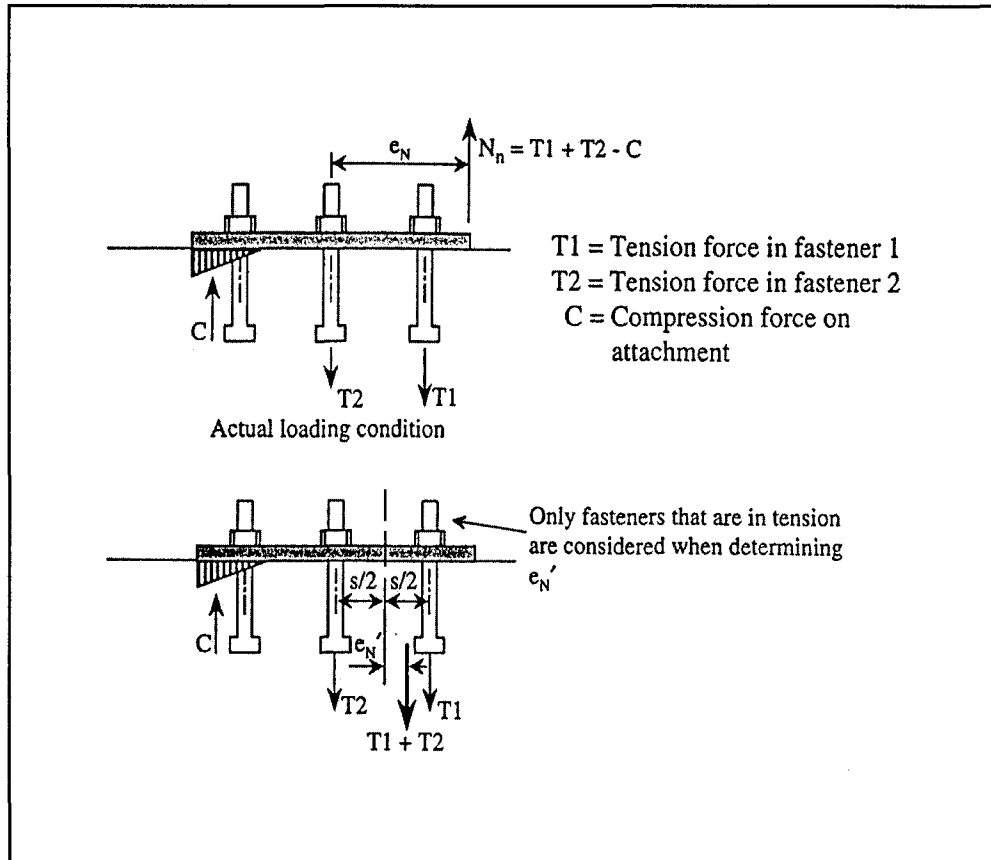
Determination of  $e_N'$  for anchor group with only some anchors in tension.
